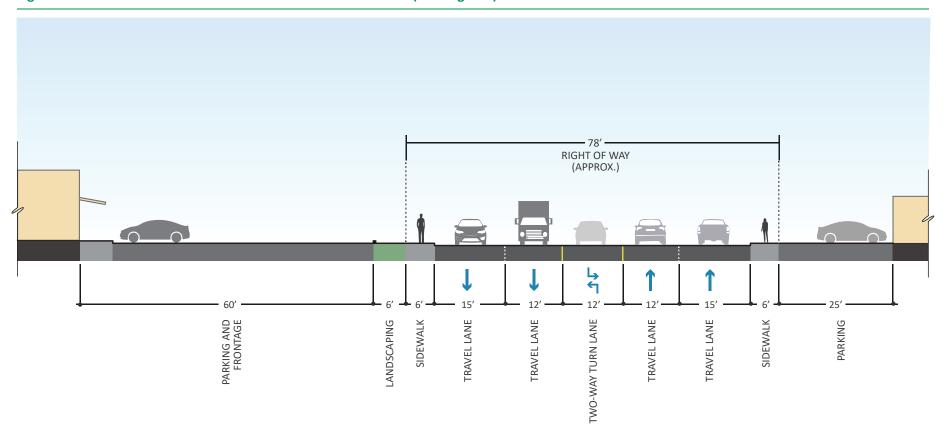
Pacheco Boulevard Between J Street and 11th Street (Looking East)
